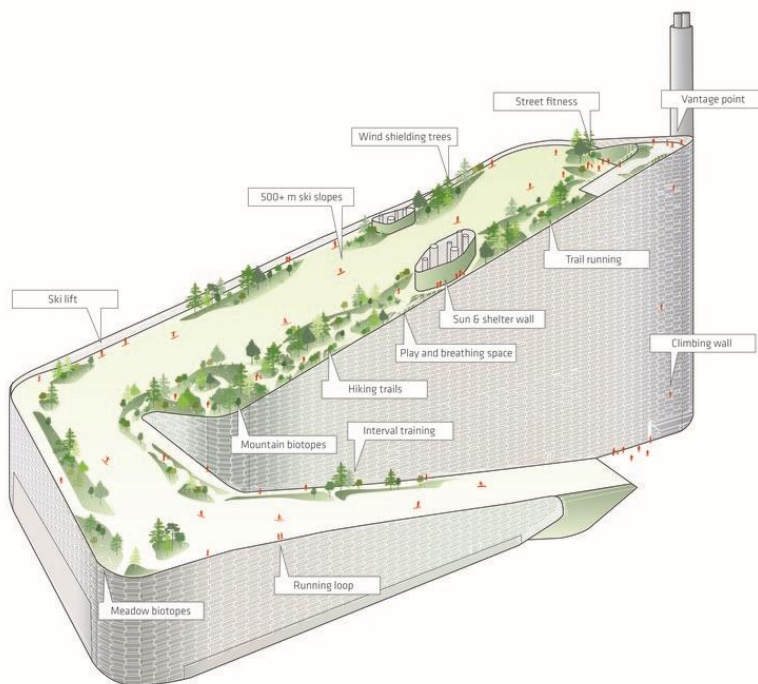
Diagram showing the roof's layout of the ski slope power plant
